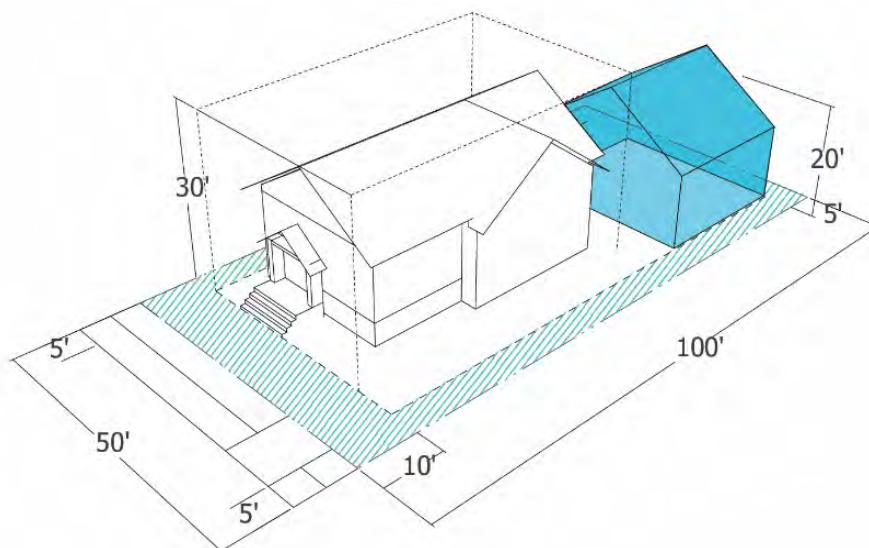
Outside of the Setbacks. This figure shows the form and bulk of all detached covered accessory structures under the new standards which establish a maximum height of 20-ft. Under the amended code, structures greater than 15-feet tall will also need to meet additional compatibility standards. Under the current code, ADUs are limited to 18 ft. high and all other accessory structure can be up to 30 or 35 feet high, depending on the single-dwelling zone.
